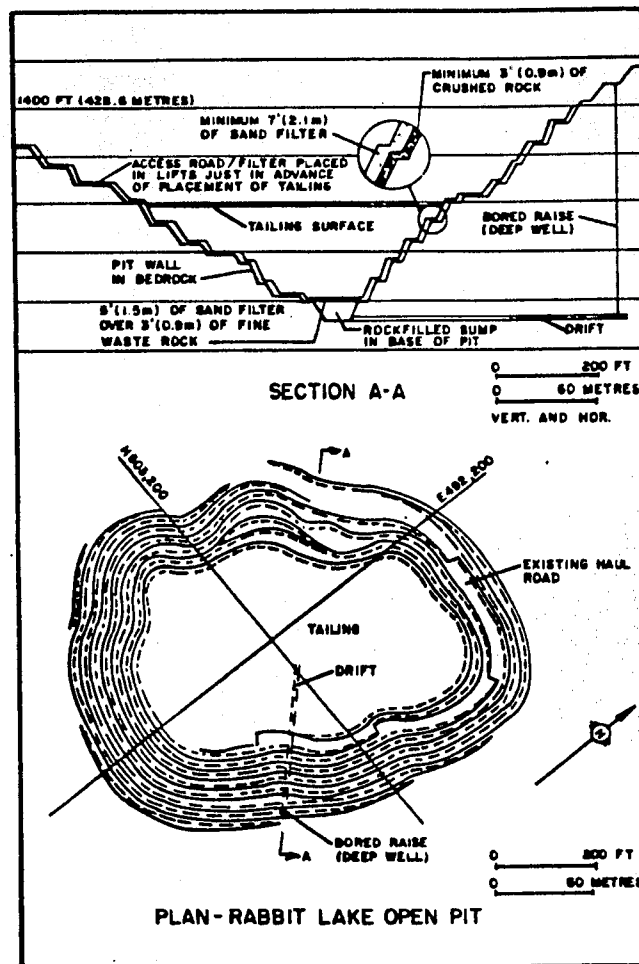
THE IN-PIT TAILING DISPOSAL SYSTEM
